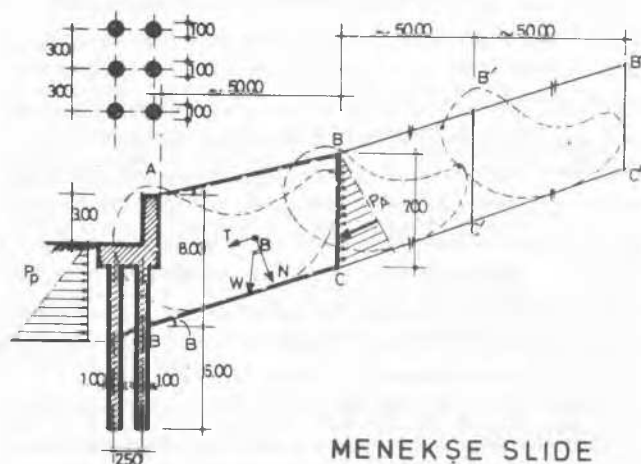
Proposed piled retaining structure as a preventive measure at Menekşe slide near Istanbul airport.
